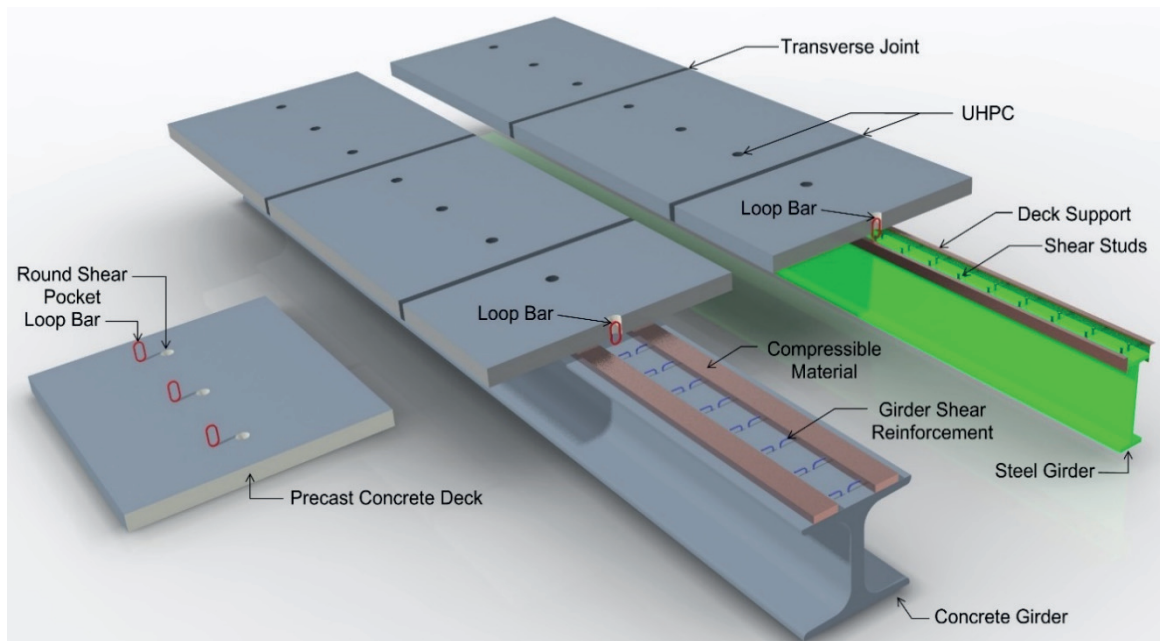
Rendered View for Proposed Precast Concrete Deck-To-Girder Connection
